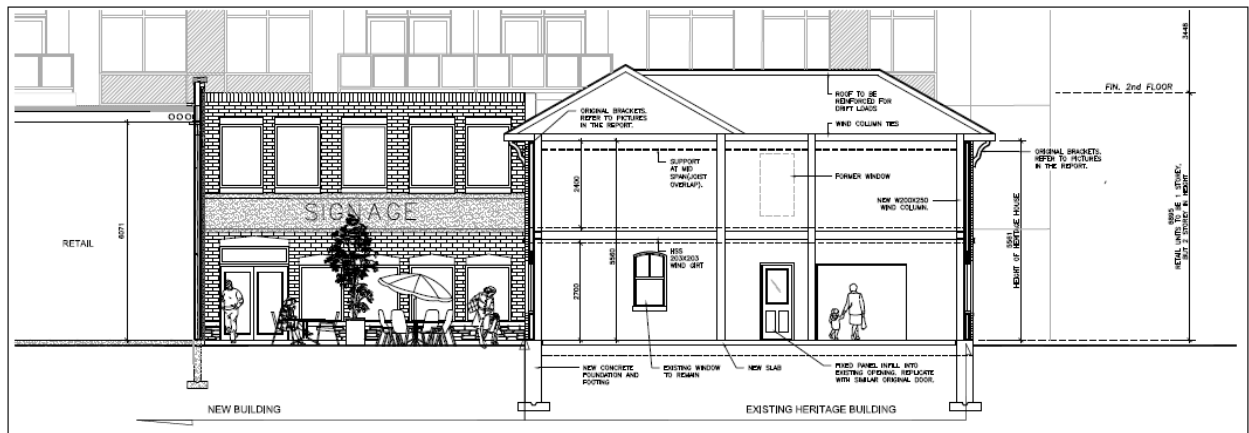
View from Hyde Park Road of Courtyard Area Separating Heritage Structure from New Building
